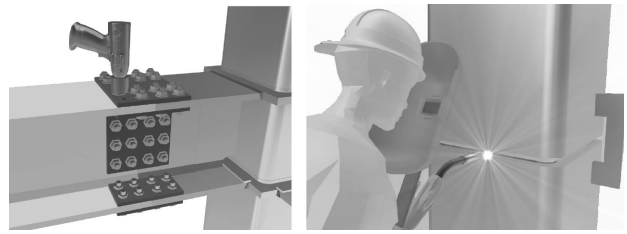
Images of joining via nut/bolt and arc welding
